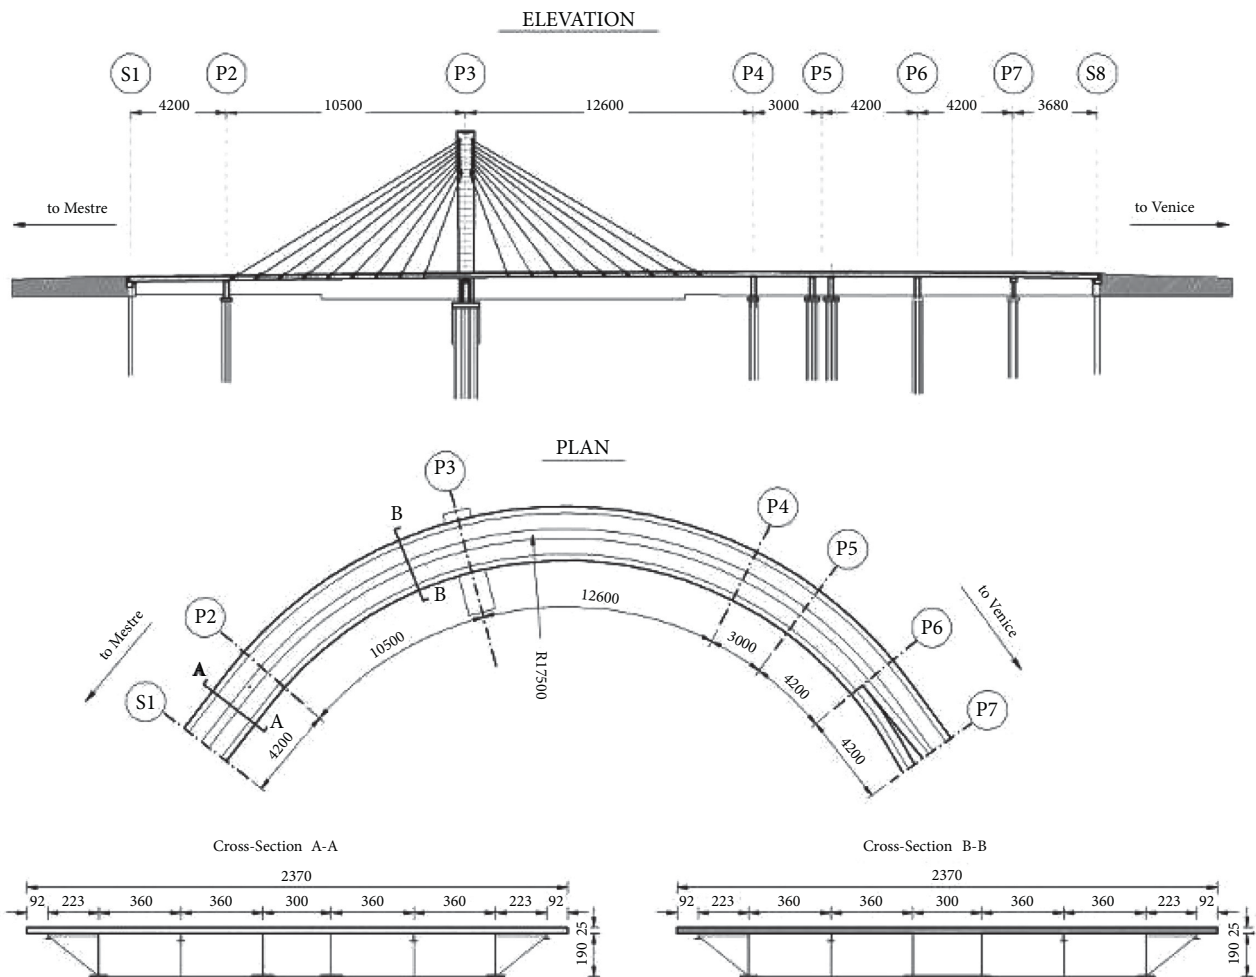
Plan view, elevation view, and typical deck cross sections (units in cm).
